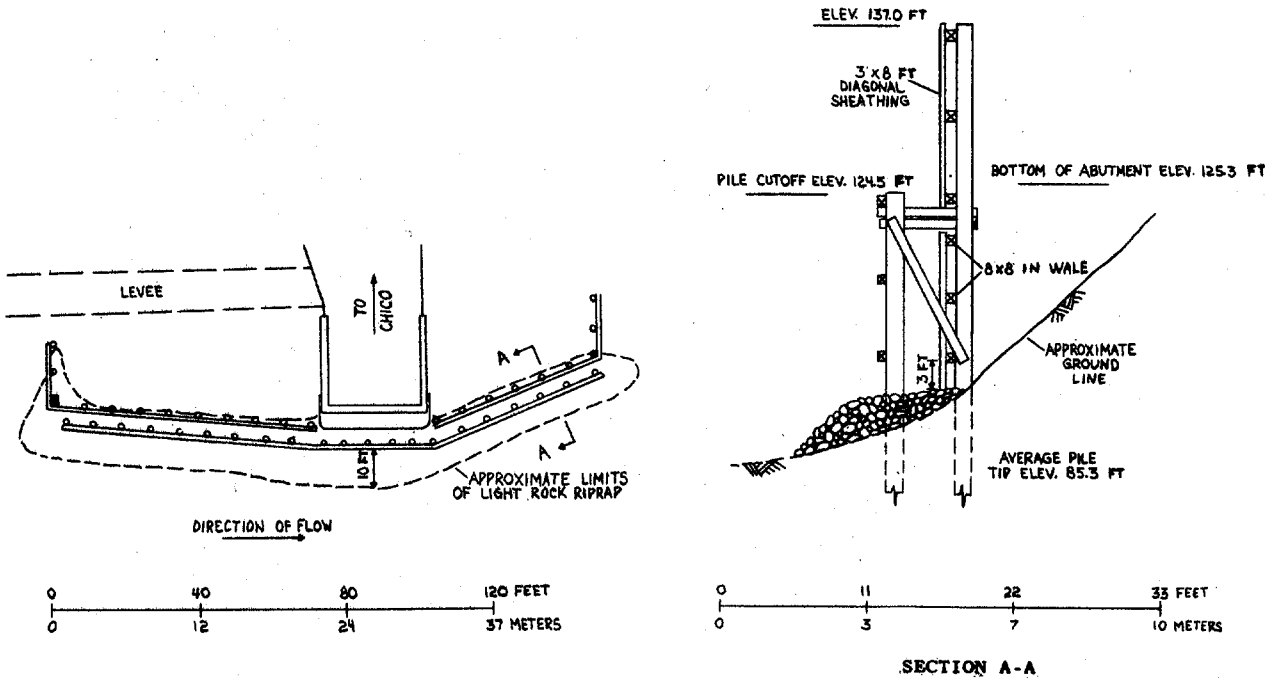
Plan (left) and cross section (right) of timber pile deflector.
